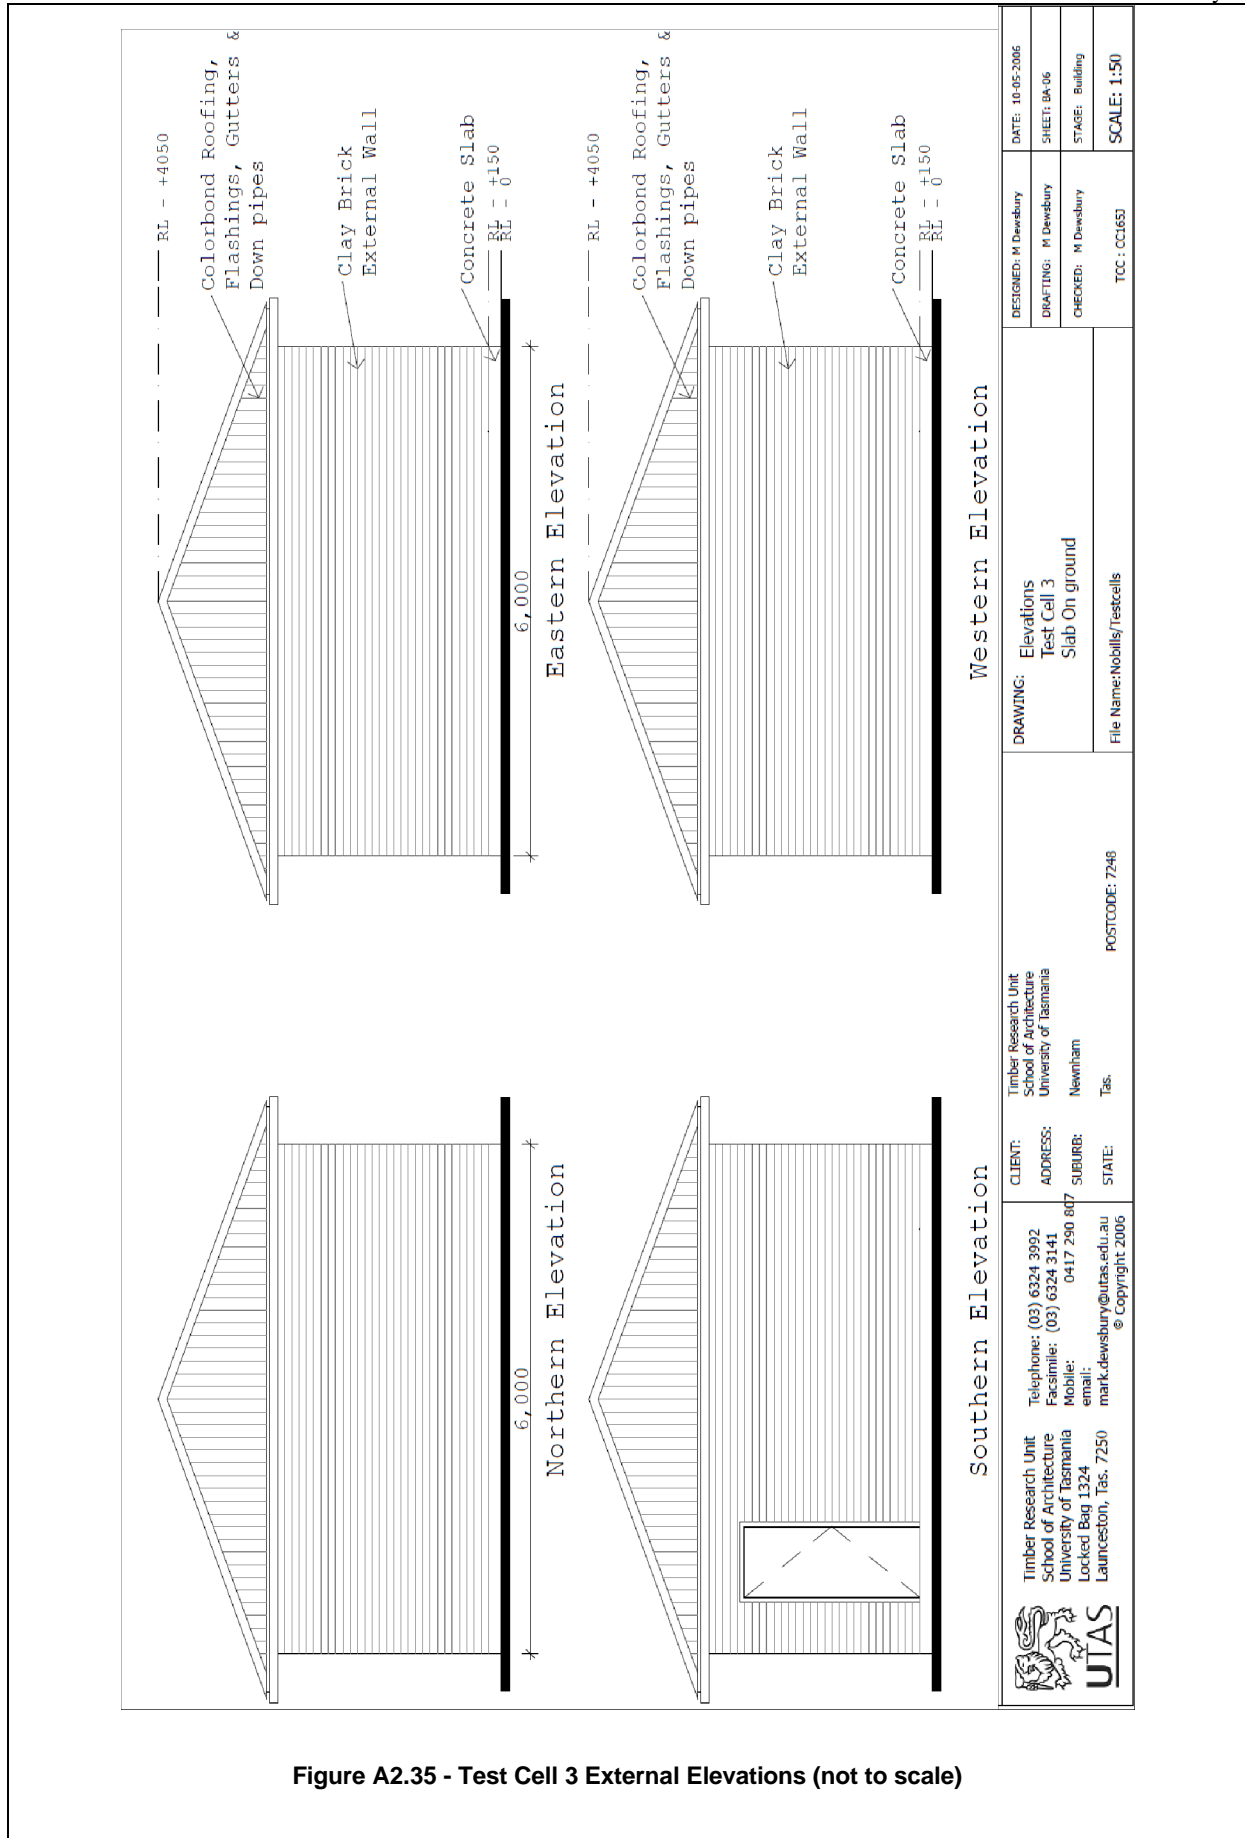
Test Cell 3 External Elevations (not to scale)
